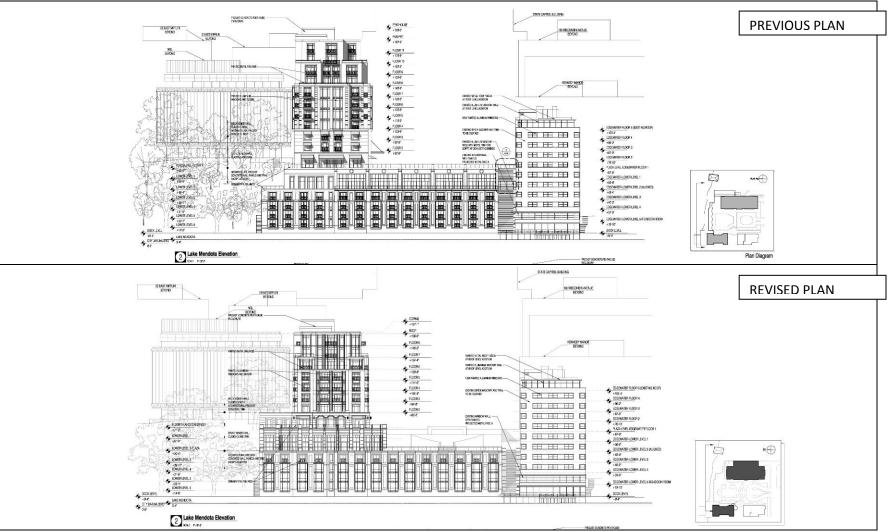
Previous Lakefront Elevation as Compared to Revised Lakefront Elevation
